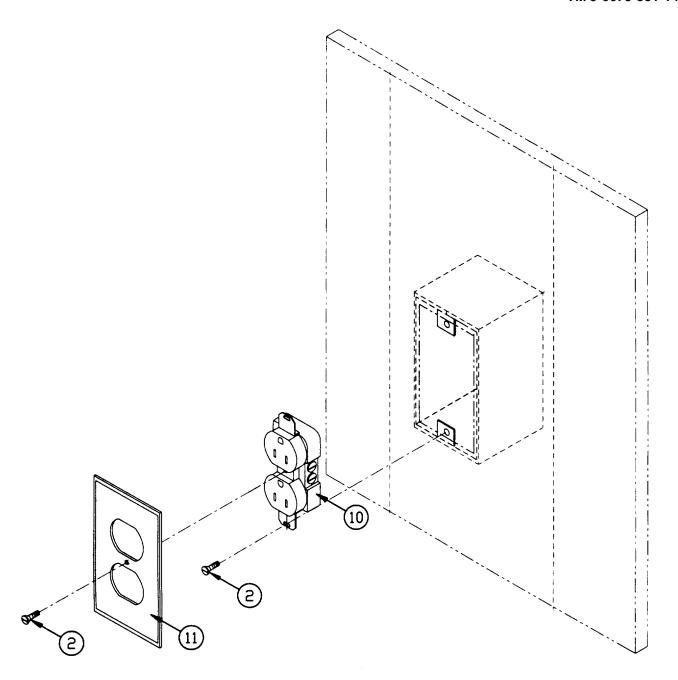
ELECTIRCAL ASSEMBLY (SHEET 3 OF 7)
